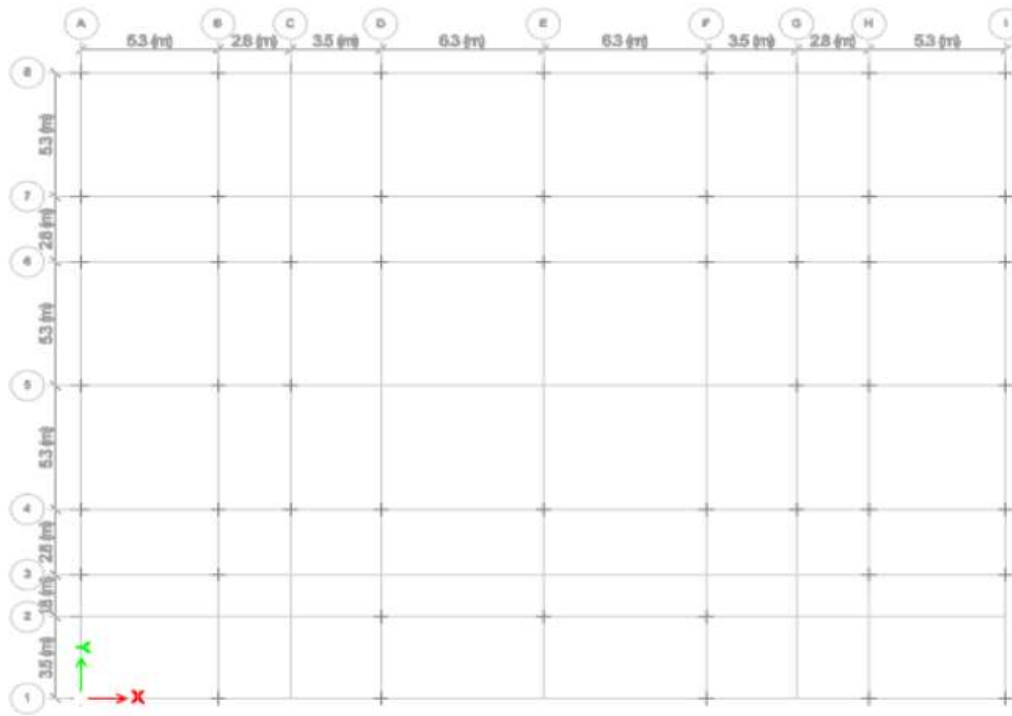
Centre Line Plan of Building from ETABS (all dimensions in m)
